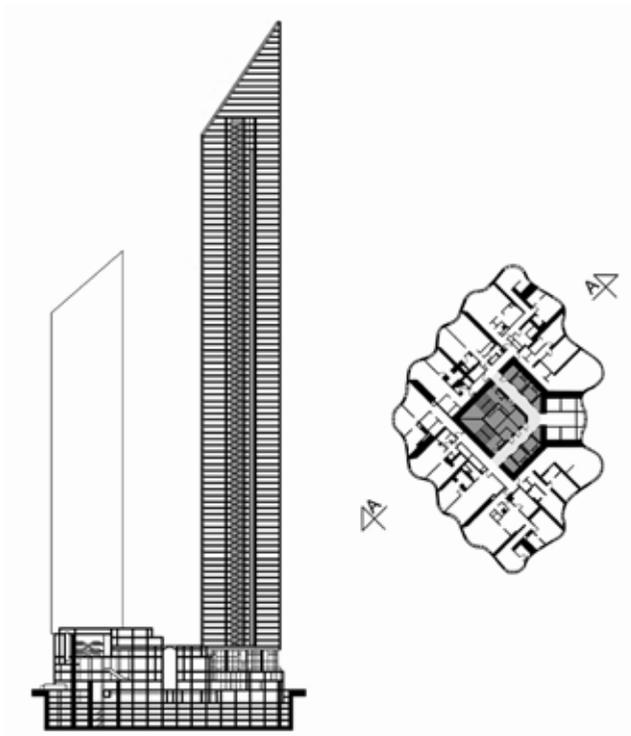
Burj Mohammed Bin Rashid Tower: plan and section (developed by authors based on [51])
